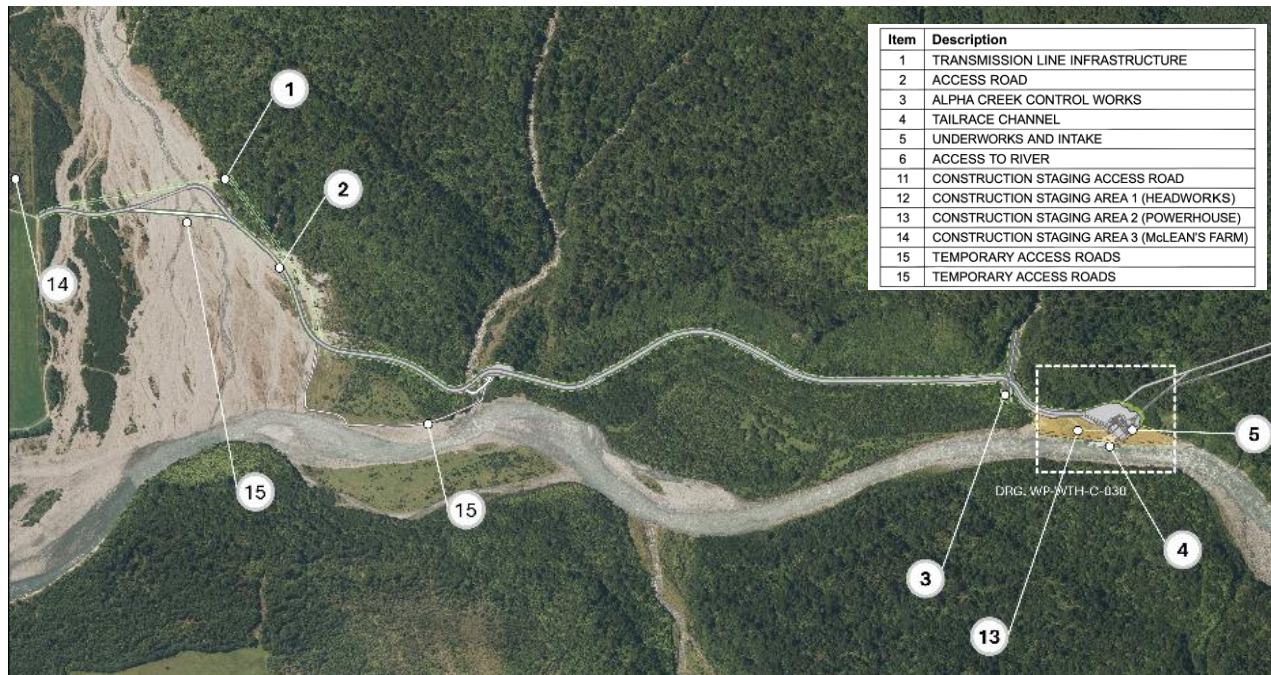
Aerial plan showing the proposed intake site and upper works Source: Engineering Design Drawings Appendix
